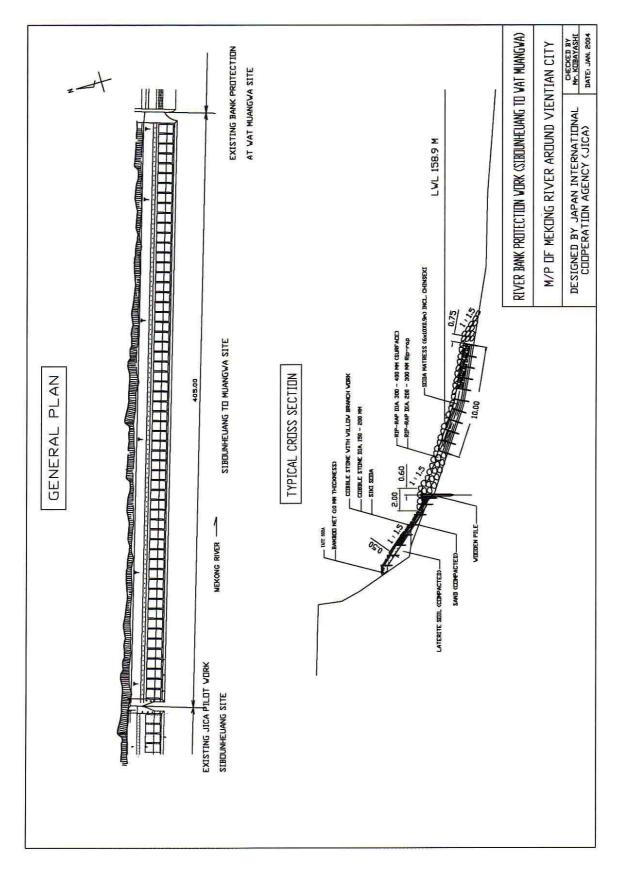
General Plan and Typical Cross Section of Riverbank Protection Work at Sibounheuang Site
